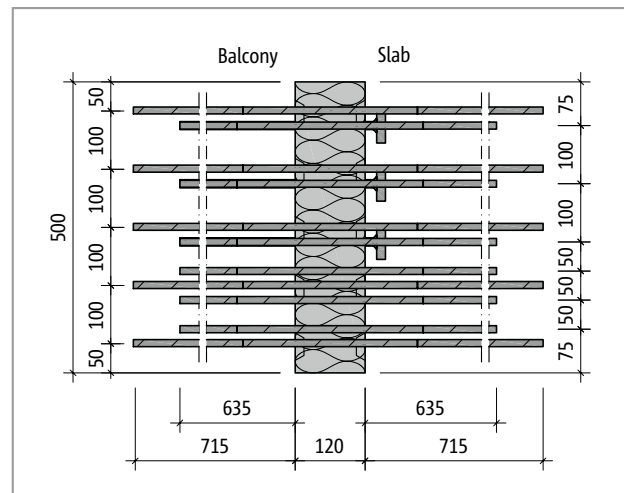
Schöck Isokorb® XT type C-R-M2-V2: Product plan view
